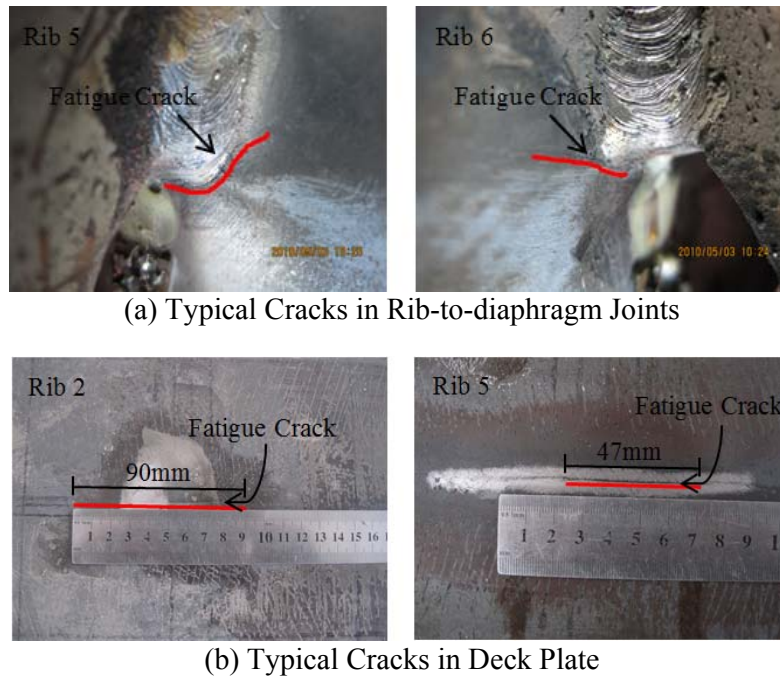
Typical Fatigue Cracks Observed During Orthotropic Steel Deck Test
